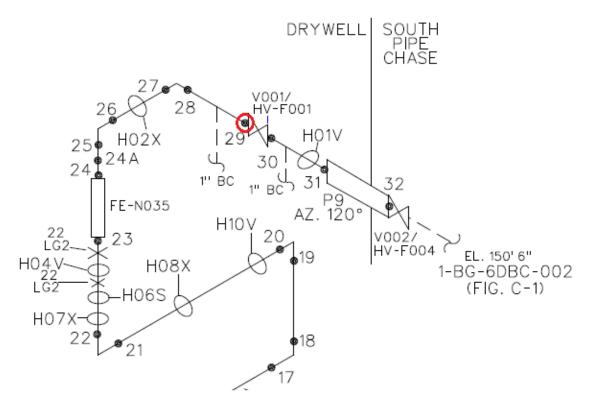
Weld 1-BG-6DBA-001-29 (Extracted from Reference DWG A-36)
